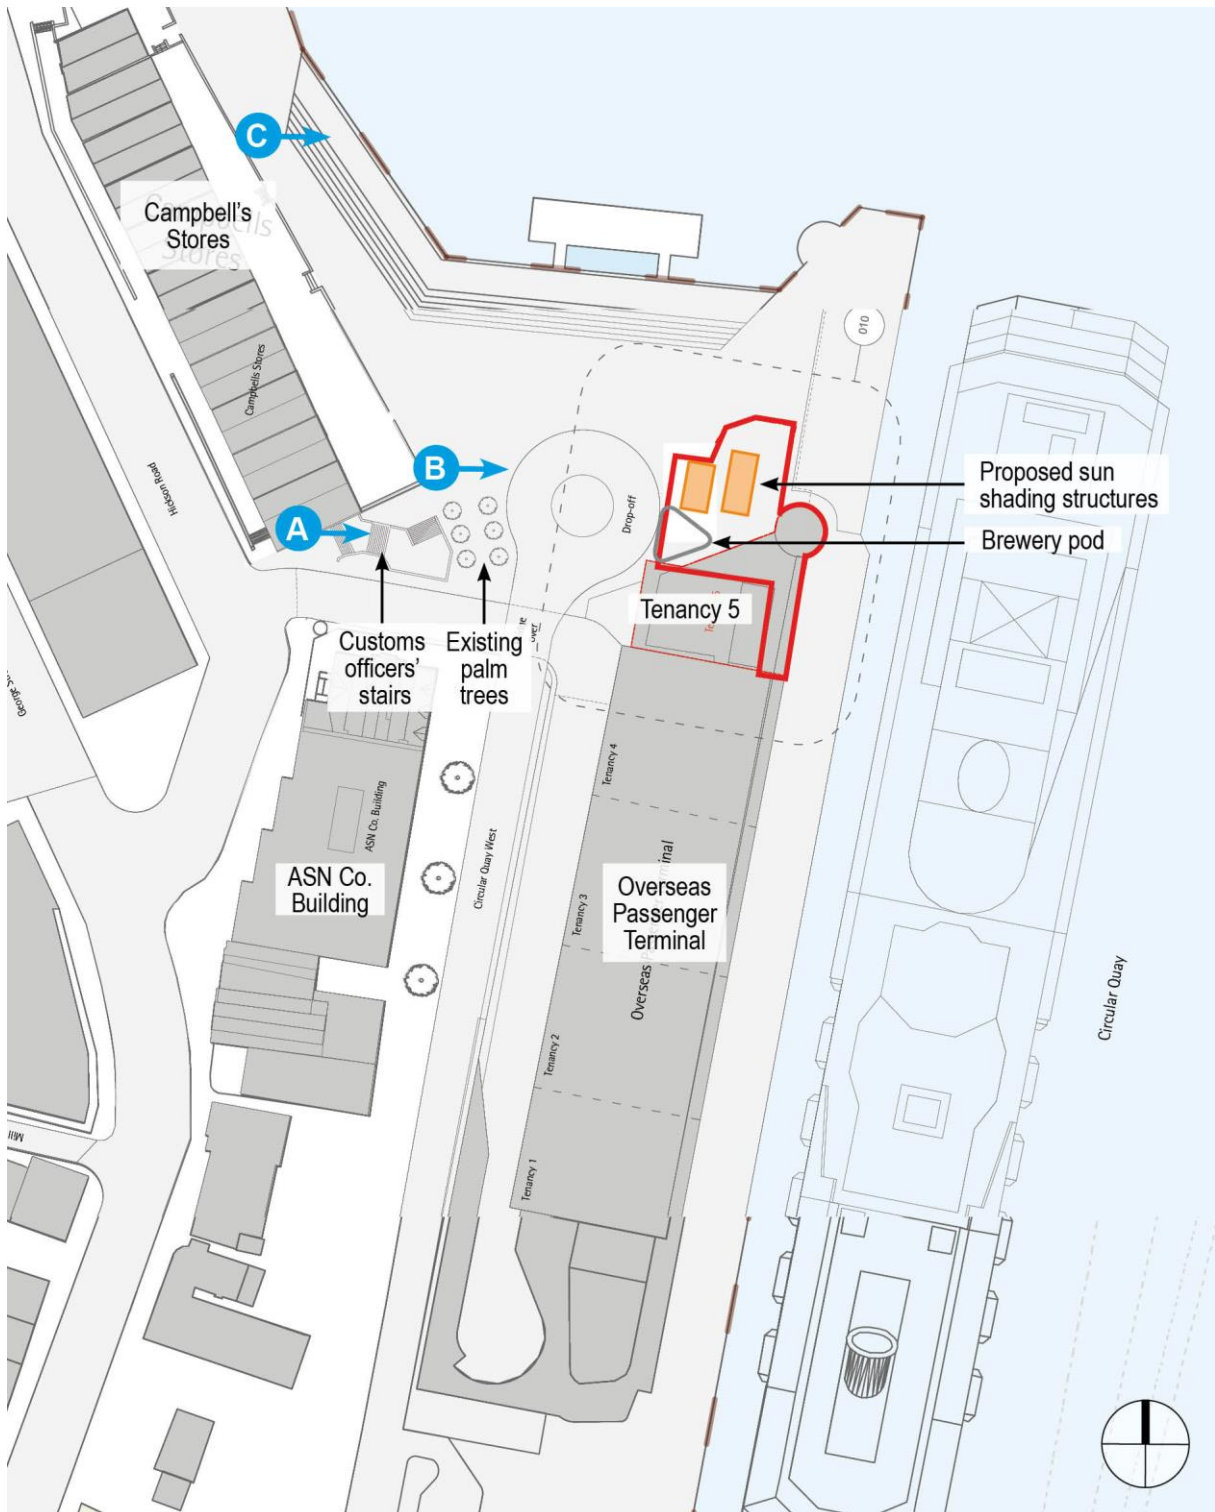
Plan showing location of Viewpoints A, B and C, looking towards the Sydney Opera House. (Source: Greenlight Design, with GML overlays, 2018)
